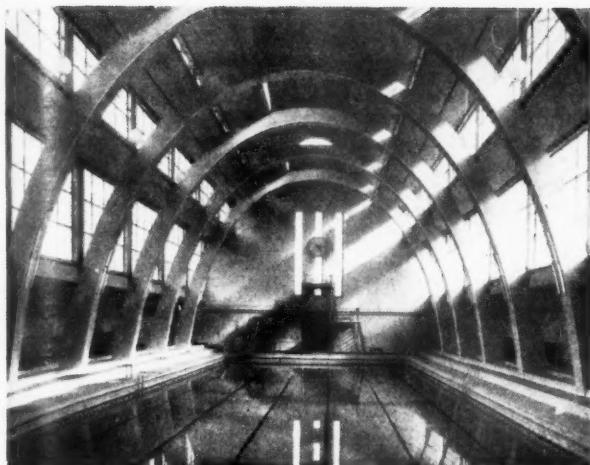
Northampton public baths, with reinforced concrete arches.
